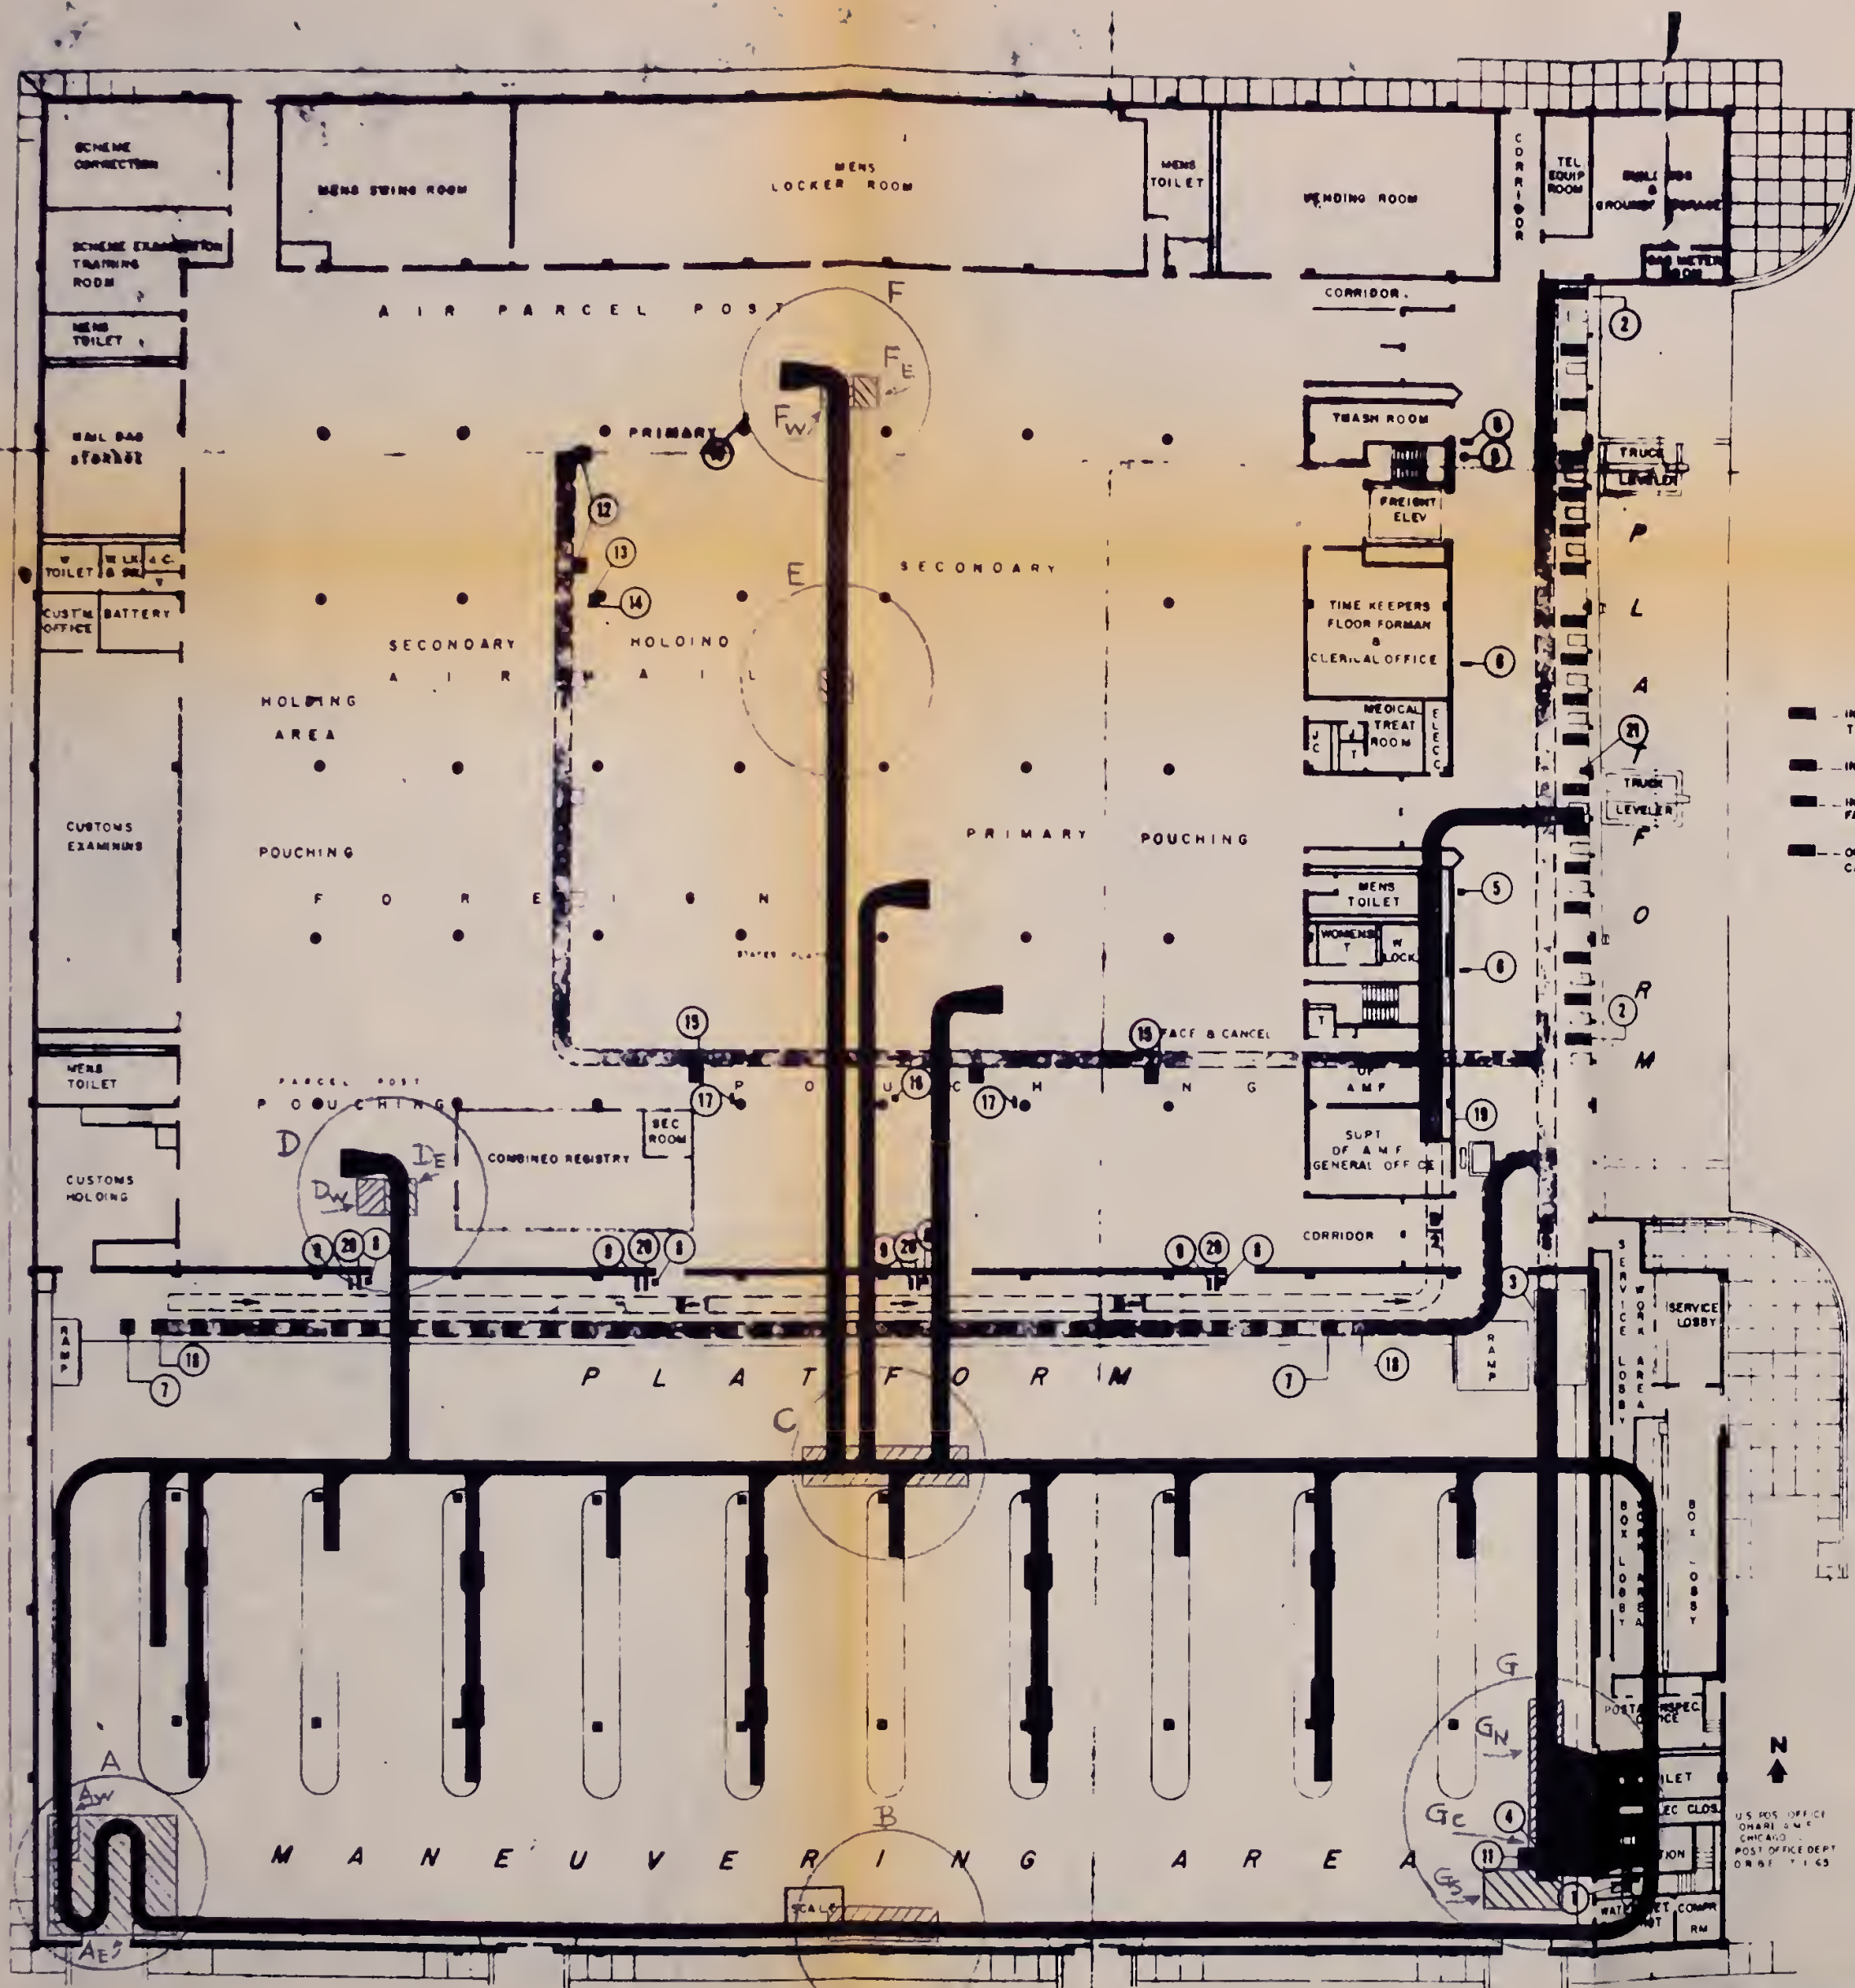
BUFFALO POST OFFICE FLOOR PLAN SHOWING DESIGNATED WORK AREAS
